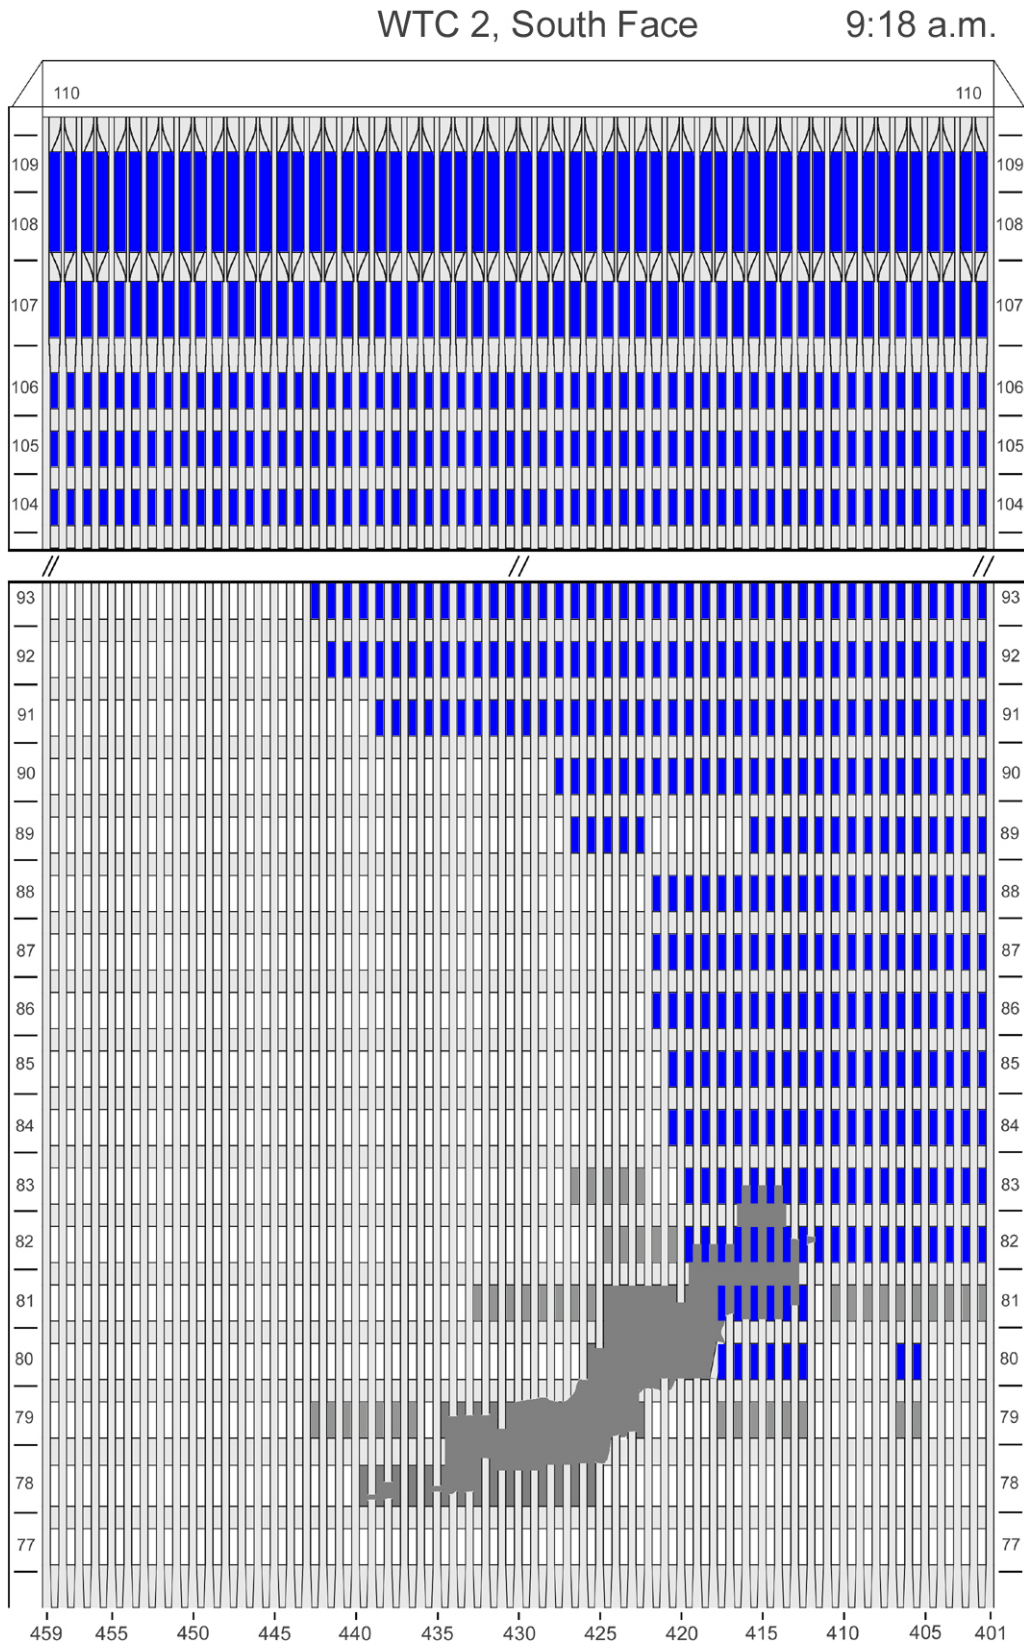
Diagram of the south face of WTC 2 for floors 77 to 93 and floors 104 to 110 at 9:18 a.m. showing windows where smoke was observed and those hidden from view.
